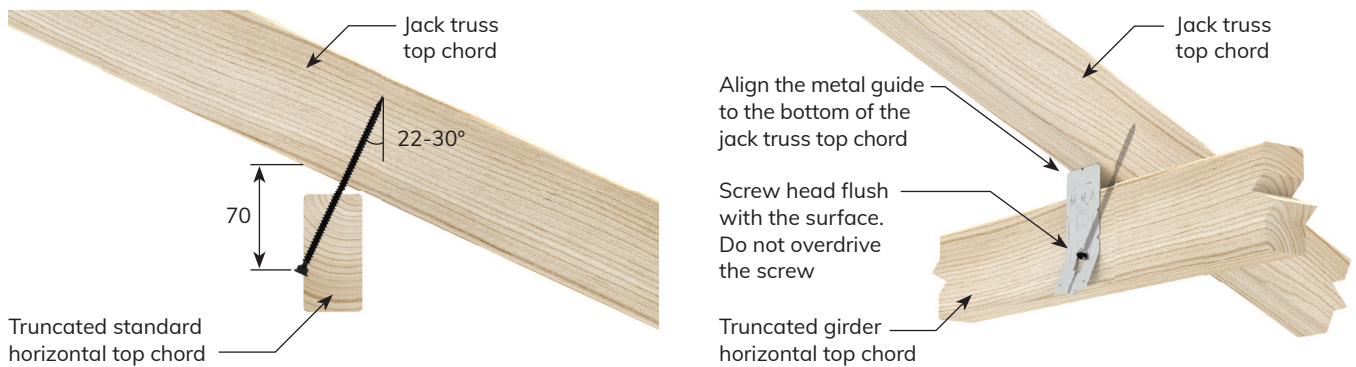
Extended jack truss to Truncated standard horizontal top chord
